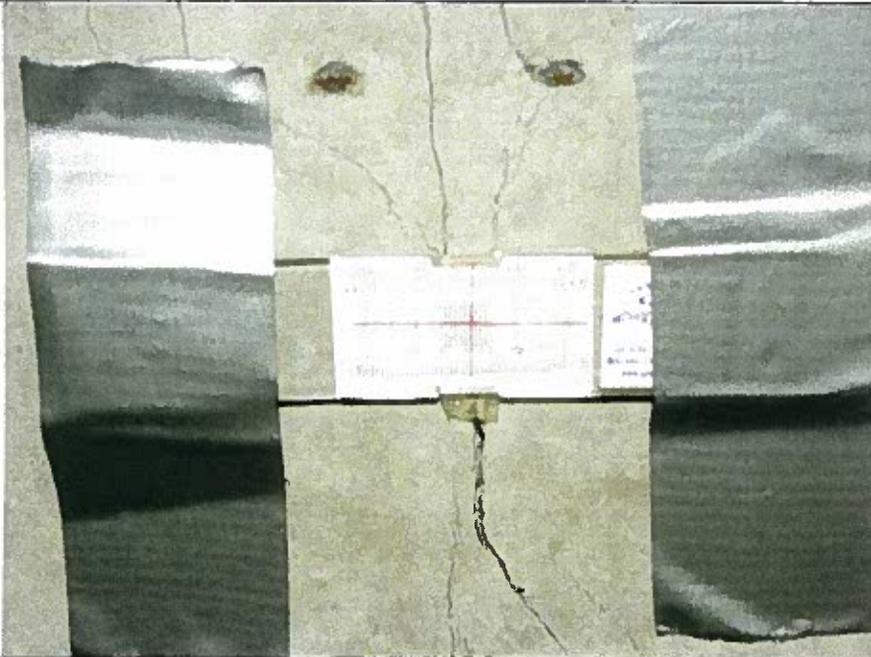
Crack monitor, cracks, and exposed reinforcing bars
